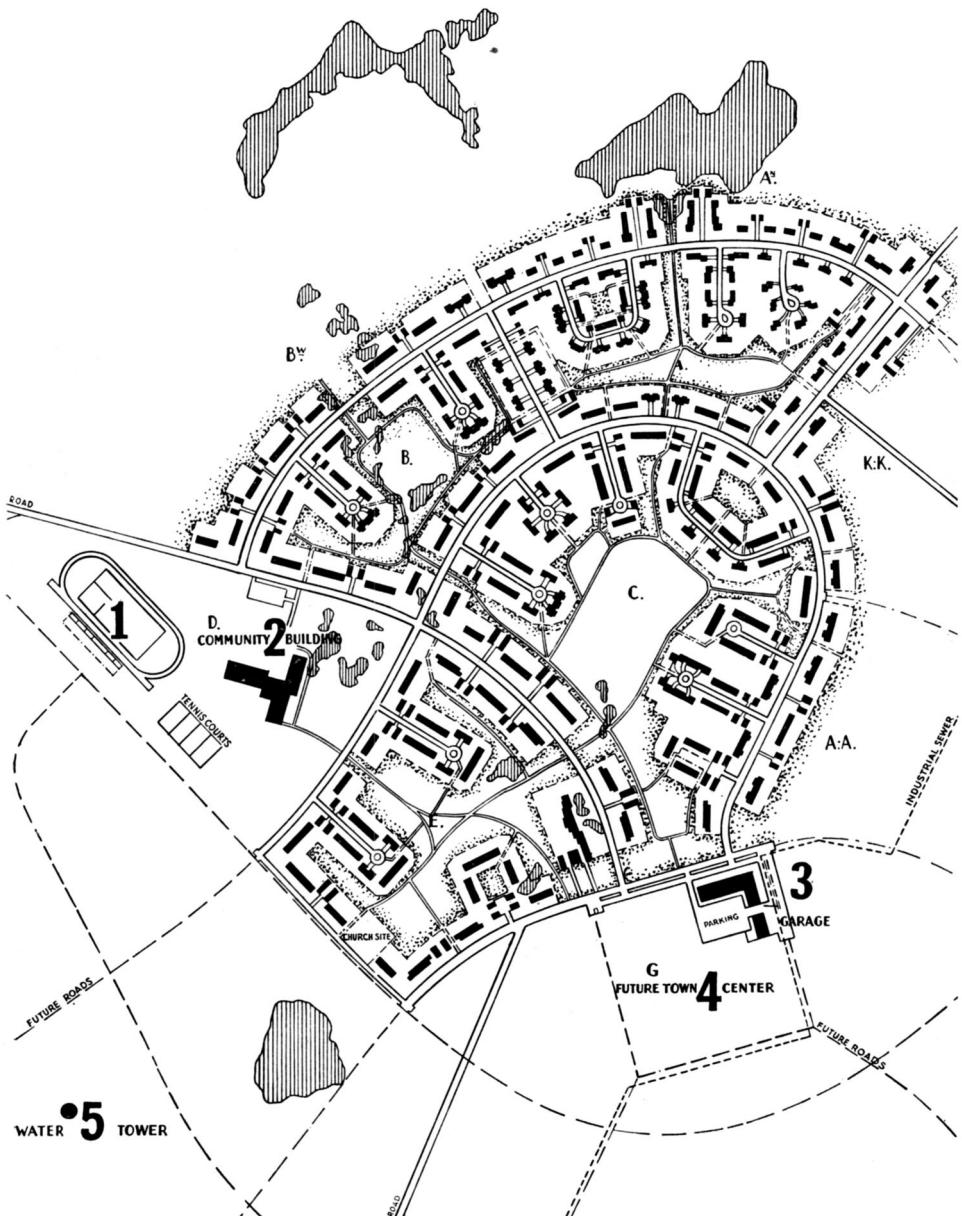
Greenbrook, New Jersey. Initial Project Plan, showing the residential blocks with interior commons and walk systems and 1/ Athletic Field; 2/ Community Building; 3/ Shops and Garage; 4/ Future Town Center; 5/ Water Tower.
